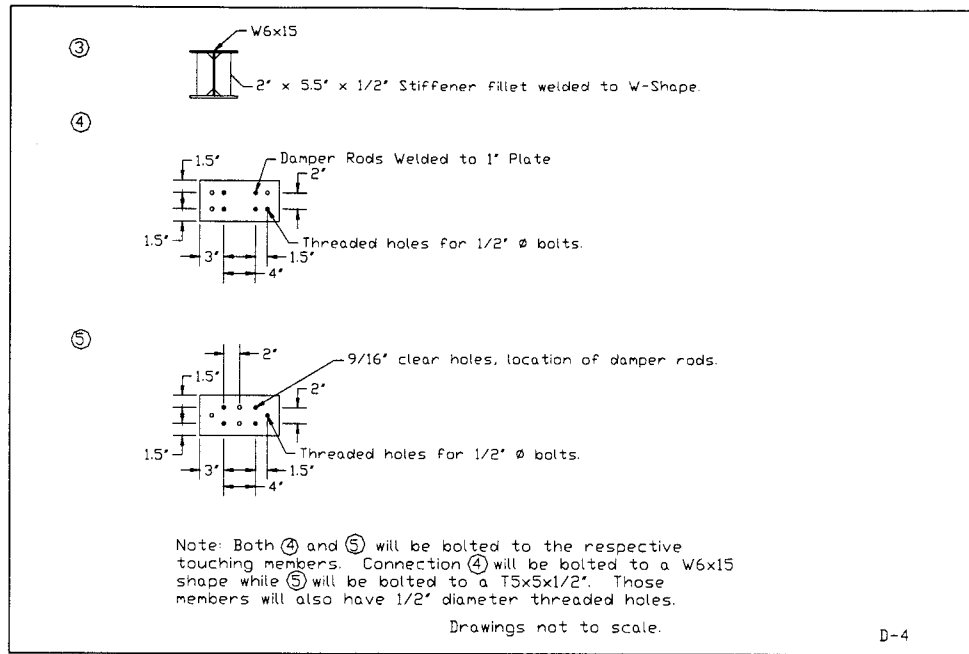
Connection Details, Small-Scale Bridge (Cont'd)
